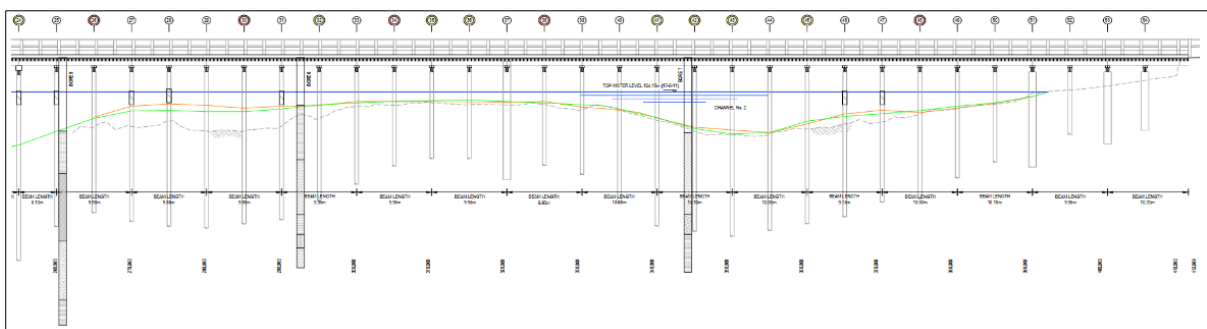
Bridge Longitudinal Section 2 (Source: Ref [1])
